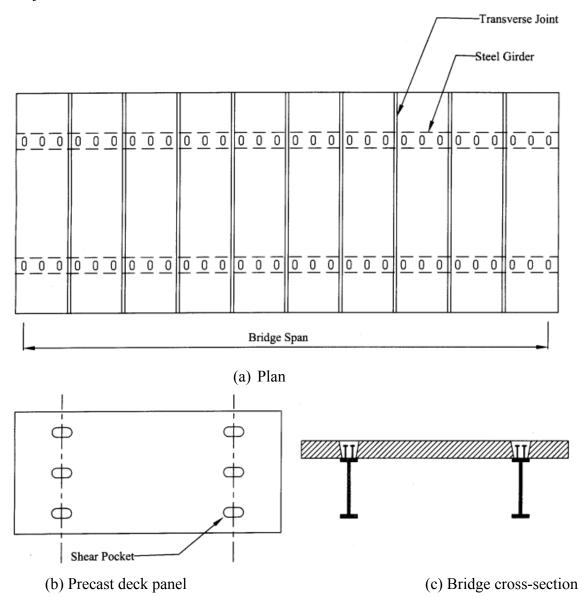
Prefabricated bridge system with full-width, full-depth, precast concrete deck panels
